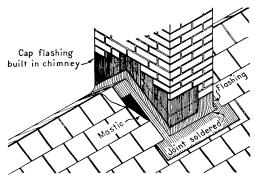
The cap flashing is built into the joints when the masonry is laid, and is folded down at least 4 inches over the base flashing that is installed when the roofing is placed.
